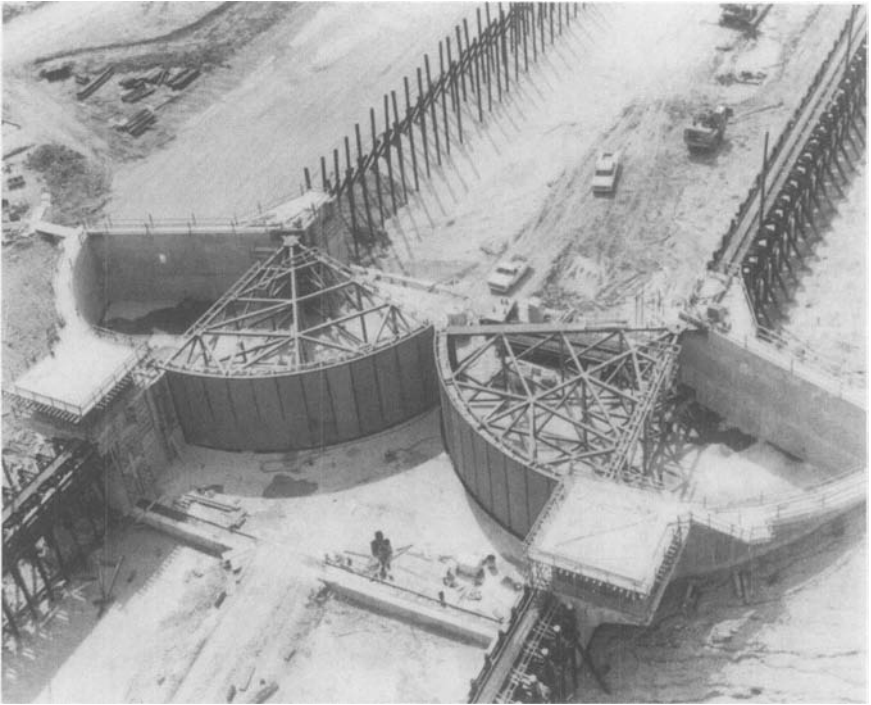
Earth Embankment with Concrete Gate Bays and Sector Gates. Leland Bowman, Gulf Intercoastal Waterway, with Design Lift of 3 ft.
